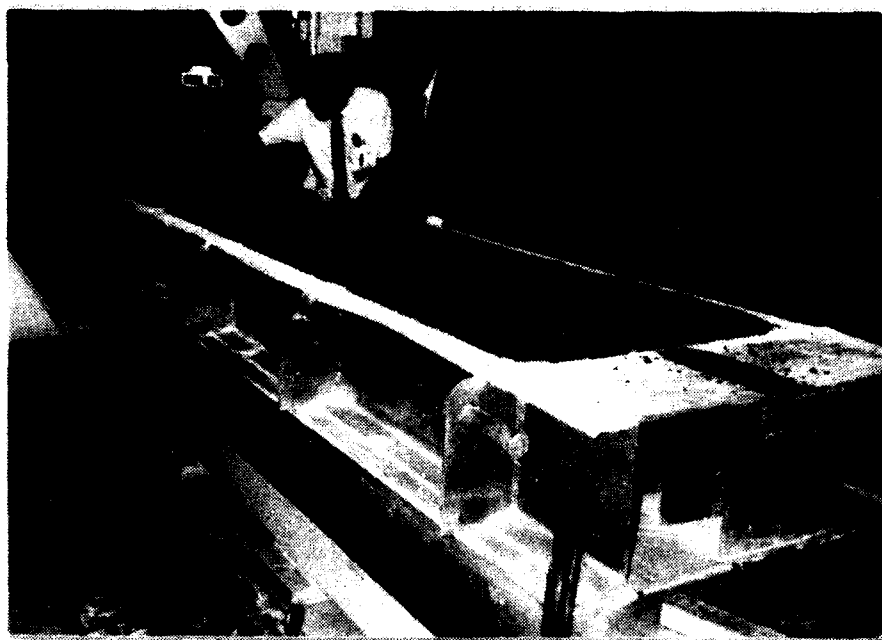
RUTTING TEST SHOWING VIDEO-TAPE OF TESTING DURING
